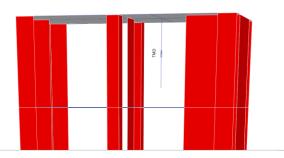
Location of Tuned Mass Damper in elevation at top story.
